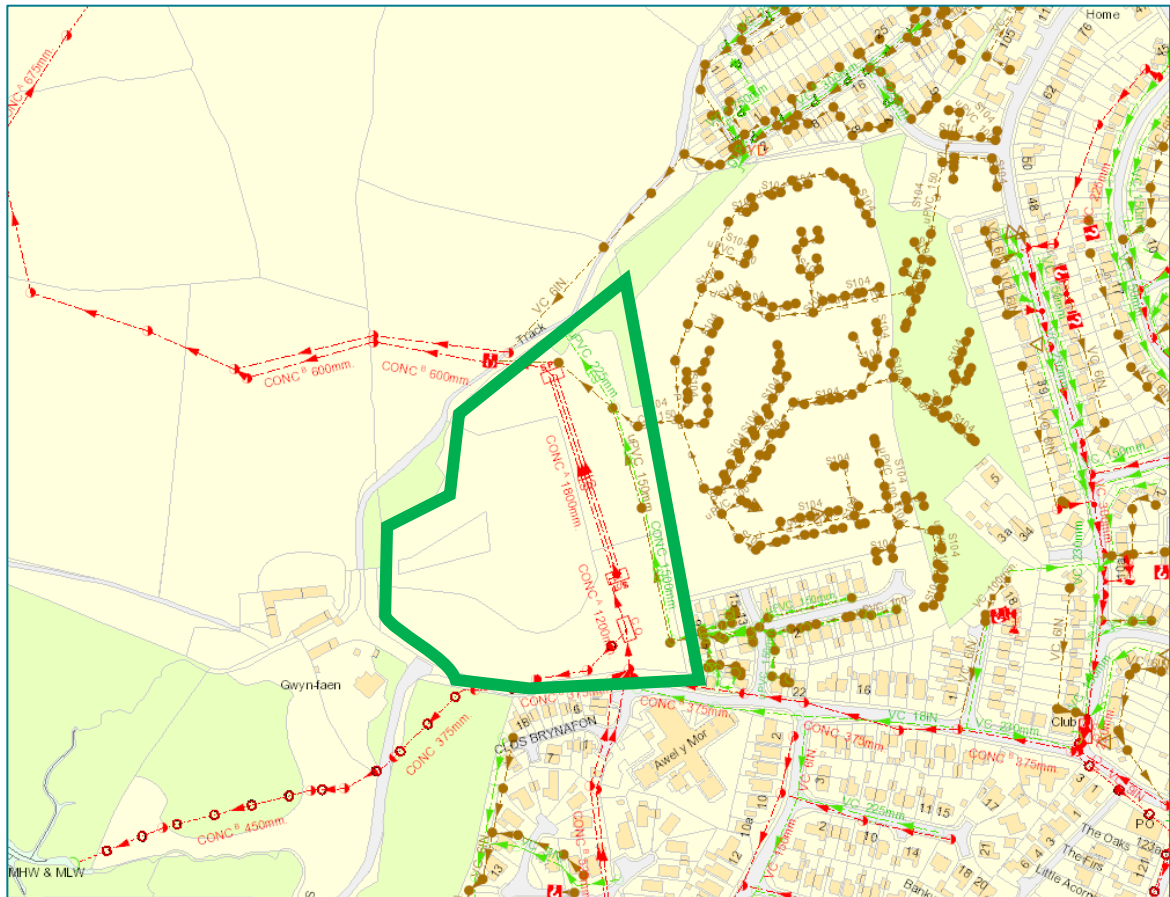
Extract of DCWW asset plan (accessed July 2024)
